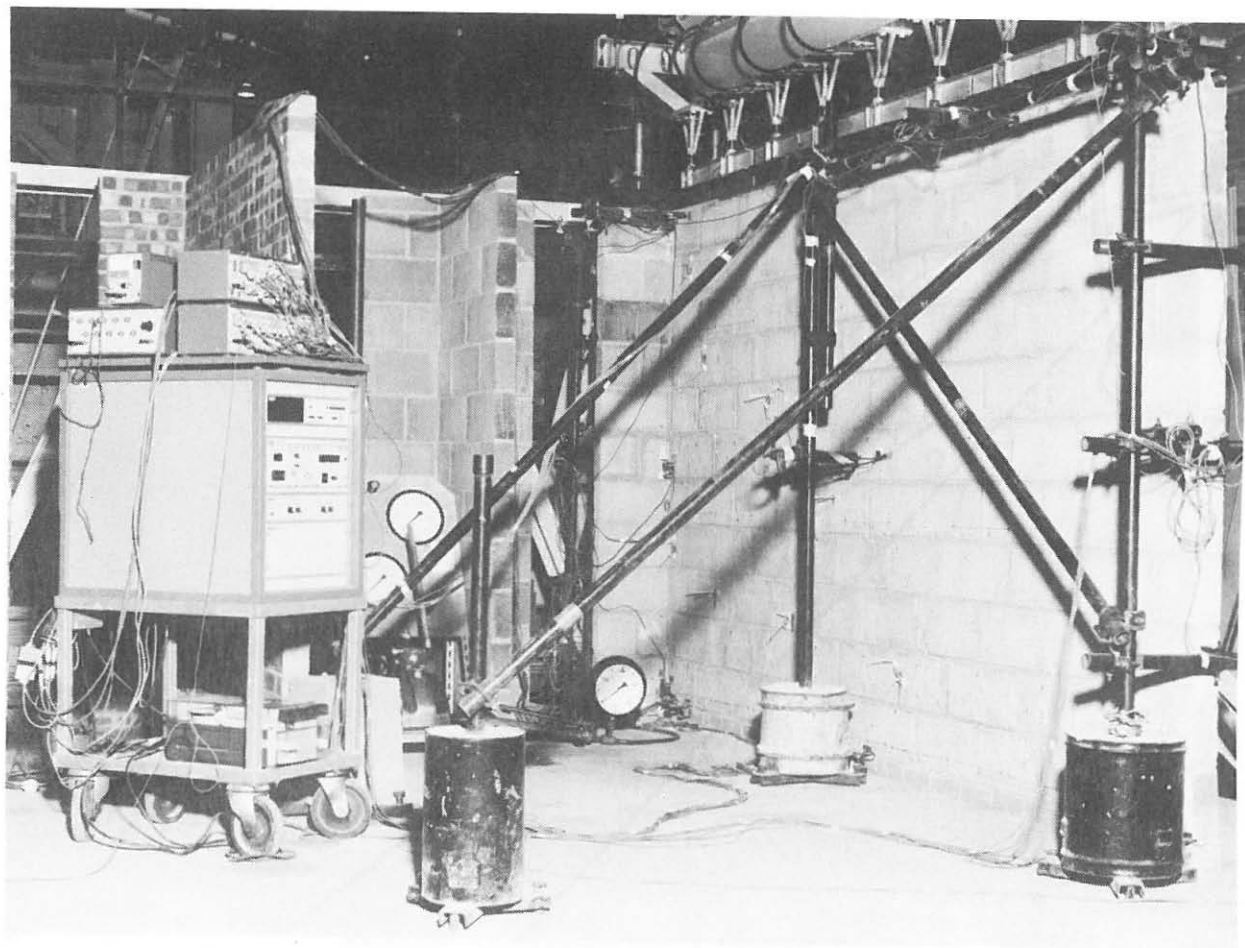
General Arrangement of Test on 4.5 m Concrete Blockwork Wall with Return
